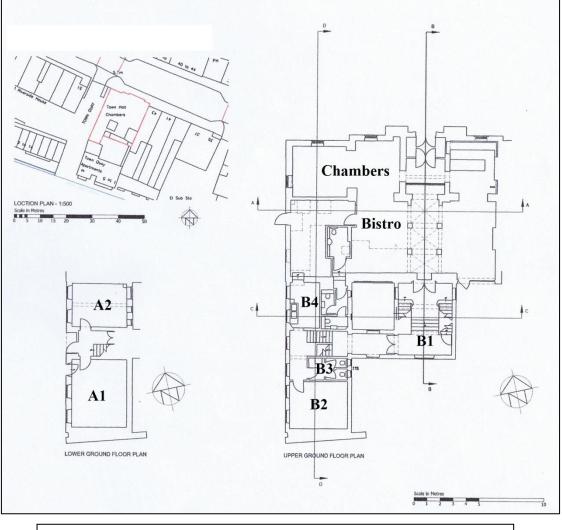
Shoreham Town Hall: Lower and Upper Ground Floor Plans Adapted from architects drawing
